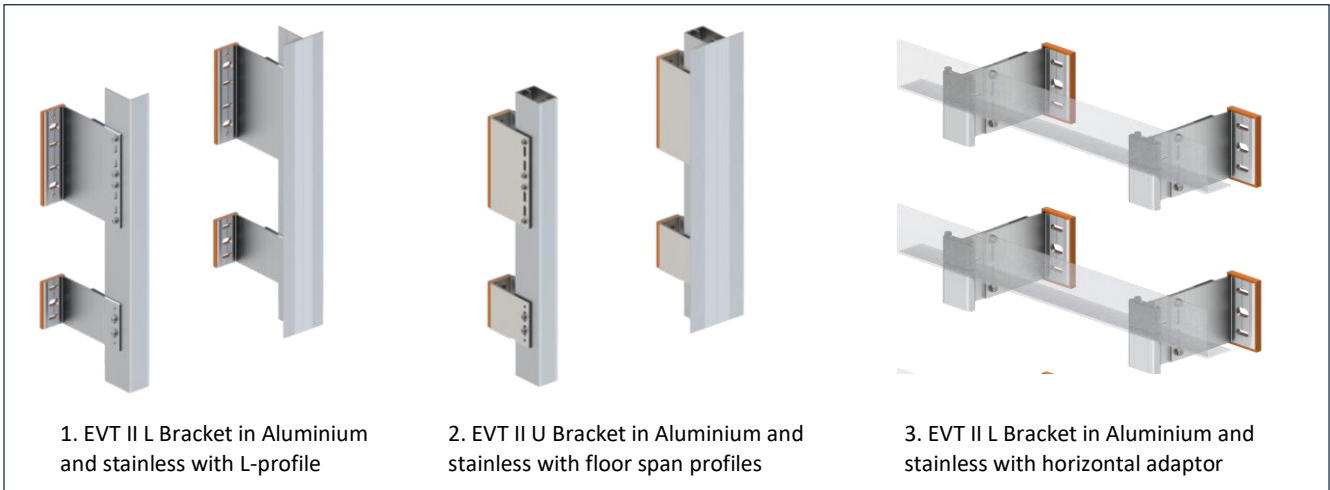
Typical RJ Facade System - EVT II support structure assemblies for supporting Briklok profiles
